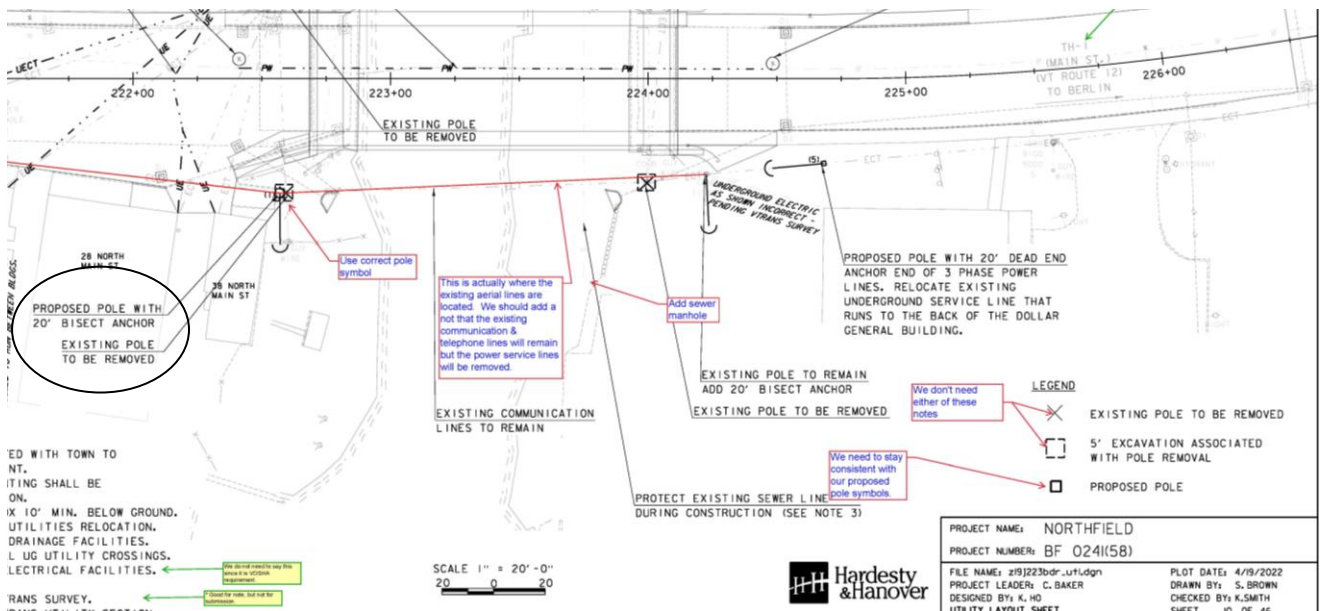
Draft utility relocation plans showing new utility pole to replace existing pole in nearly same location at 38 N. Main Street, Northfield.
